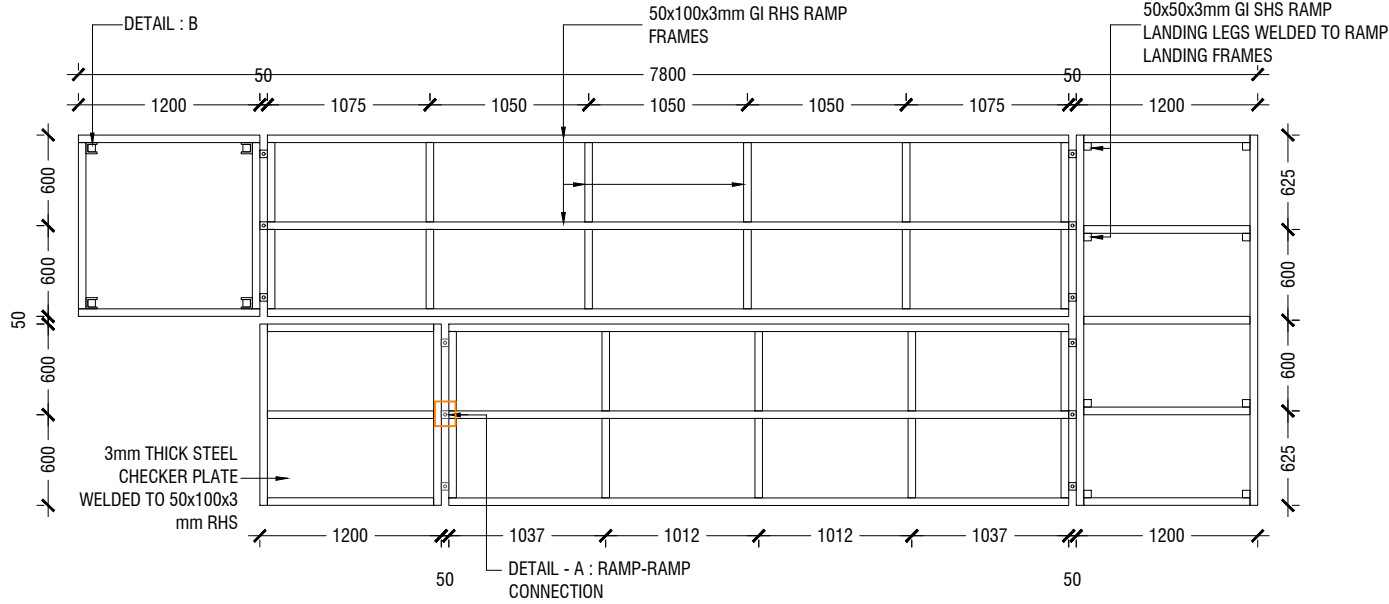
(MAIN ENTRANCE RAMP DETAIL)
